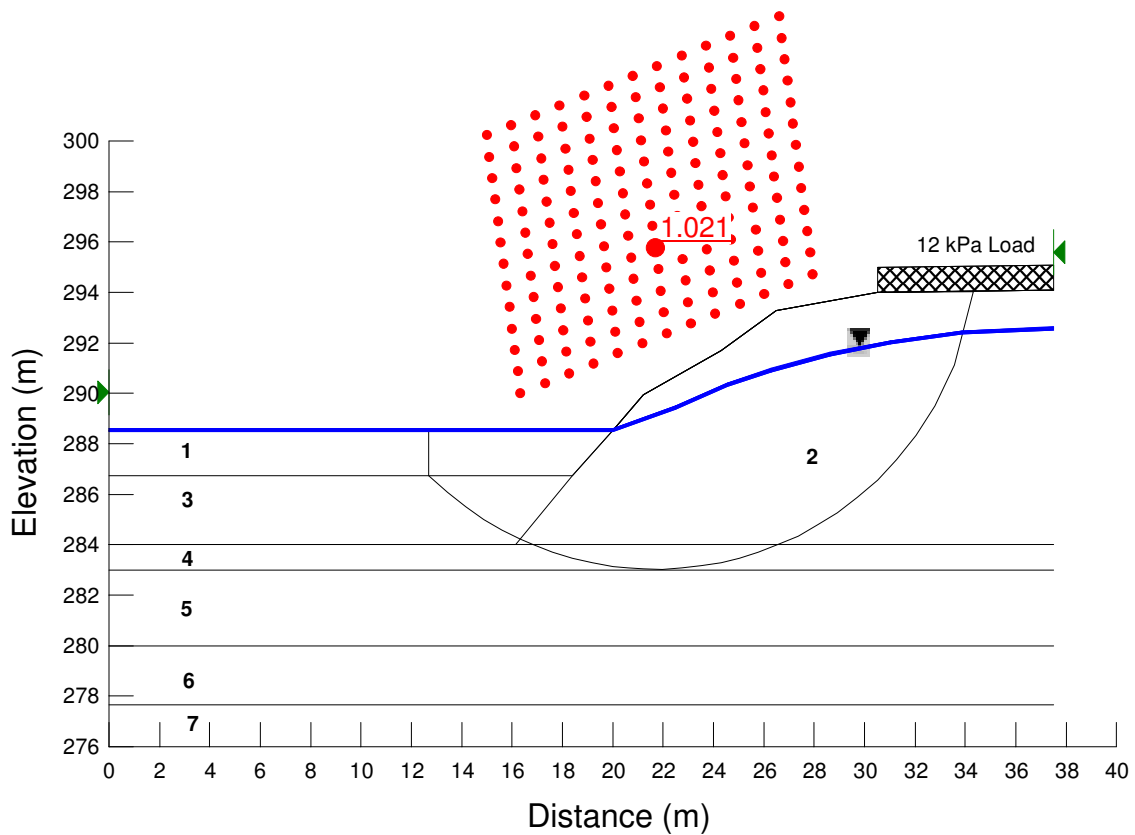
Stability of HWY11 Road Section at Sta. 14+800
